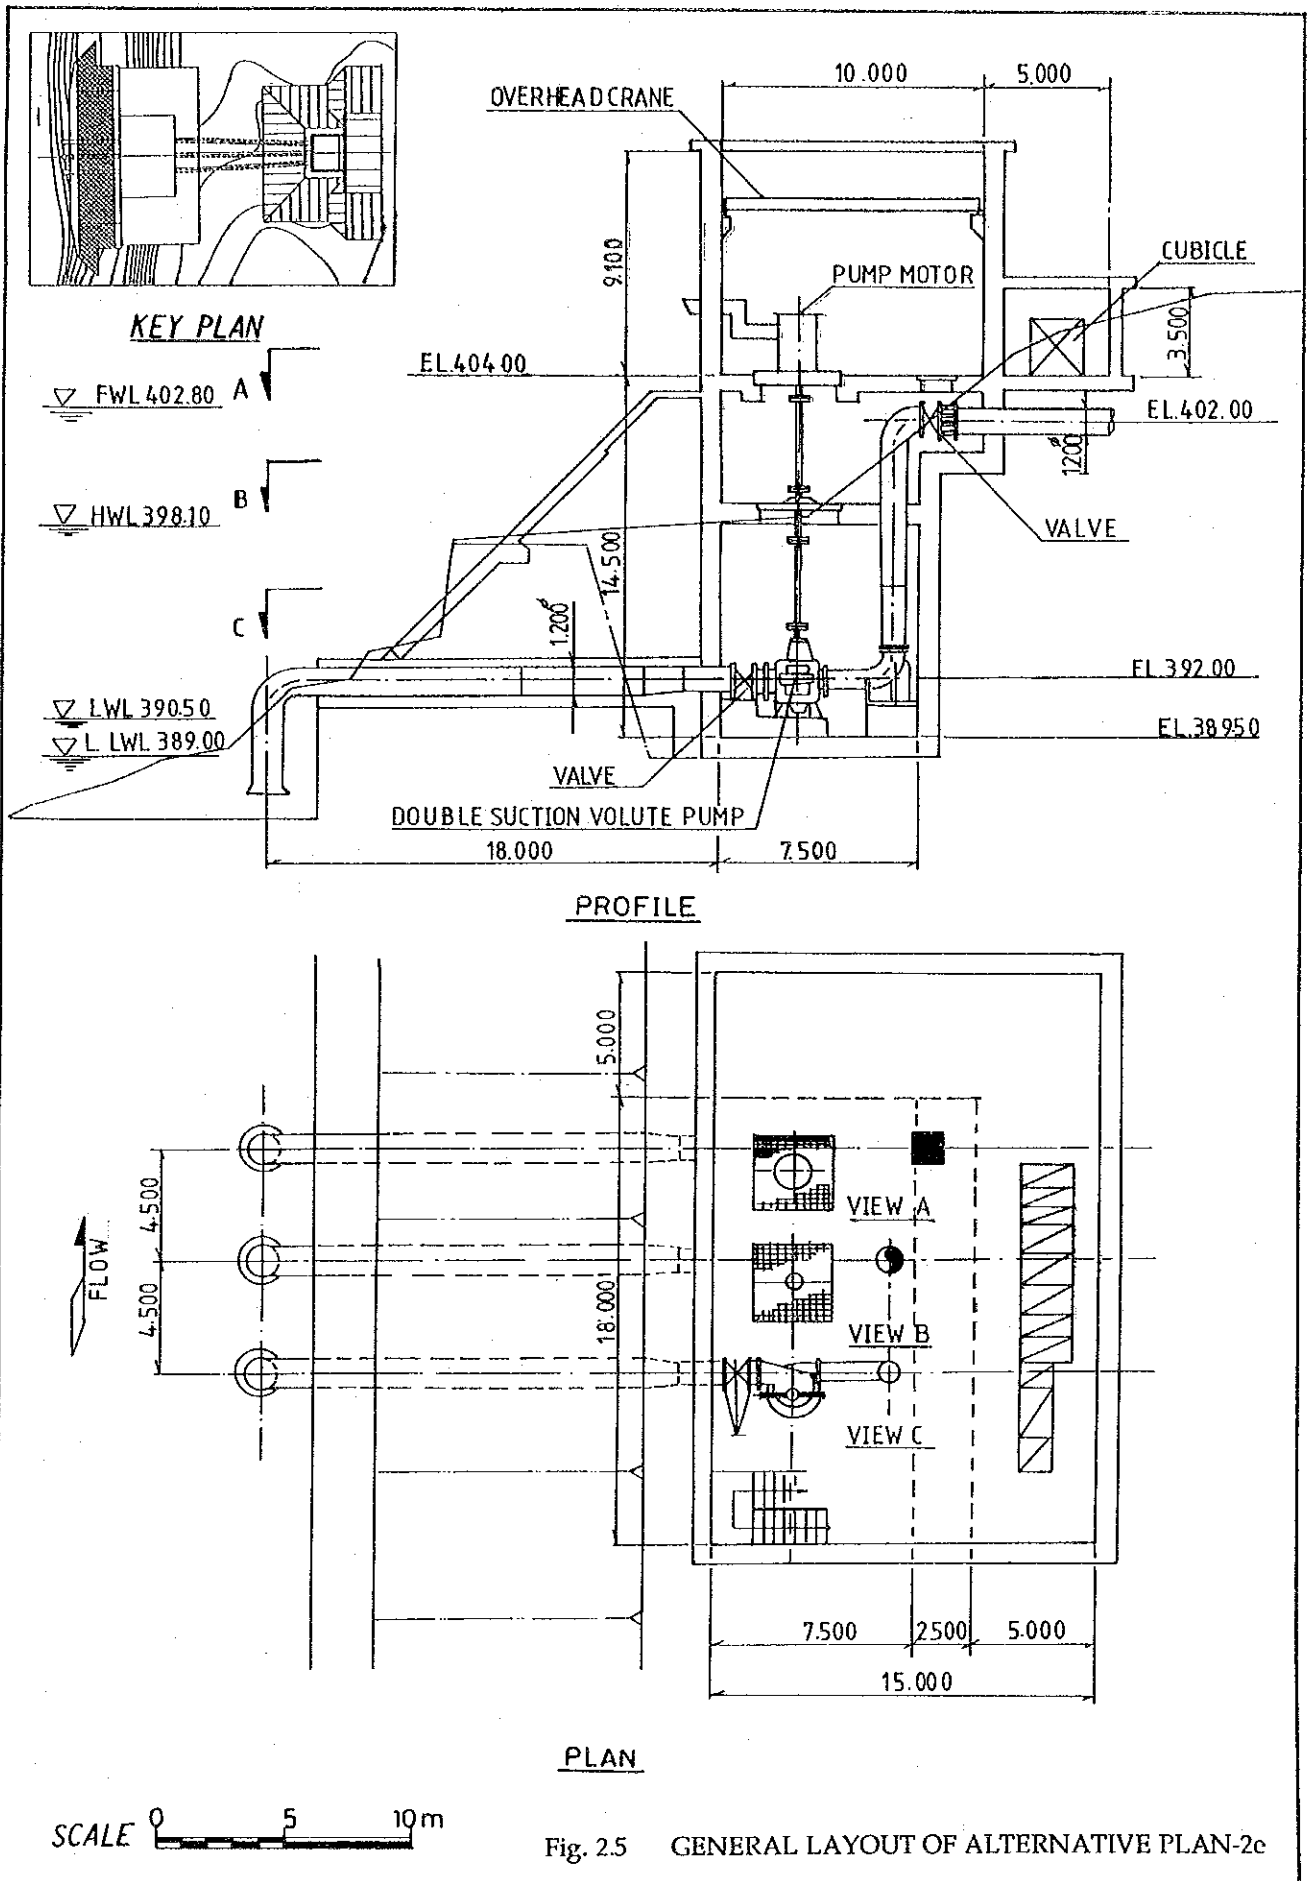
GENERAL LAYOUT OF ALTERNATIVE PLAN-2c
